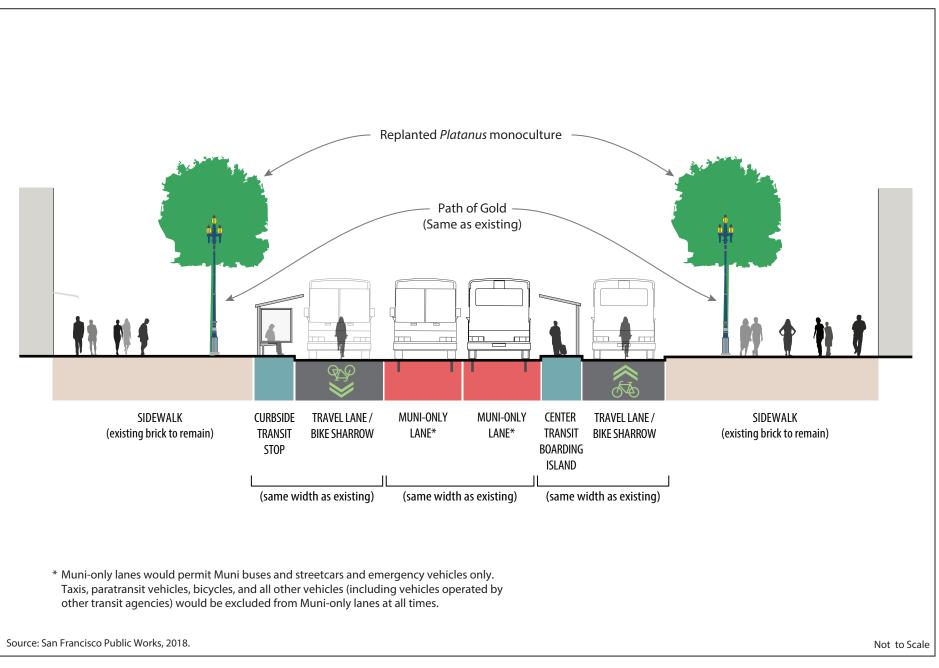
Full Preservation Alternative Typical Mid-Block Cross Section of Market Street
